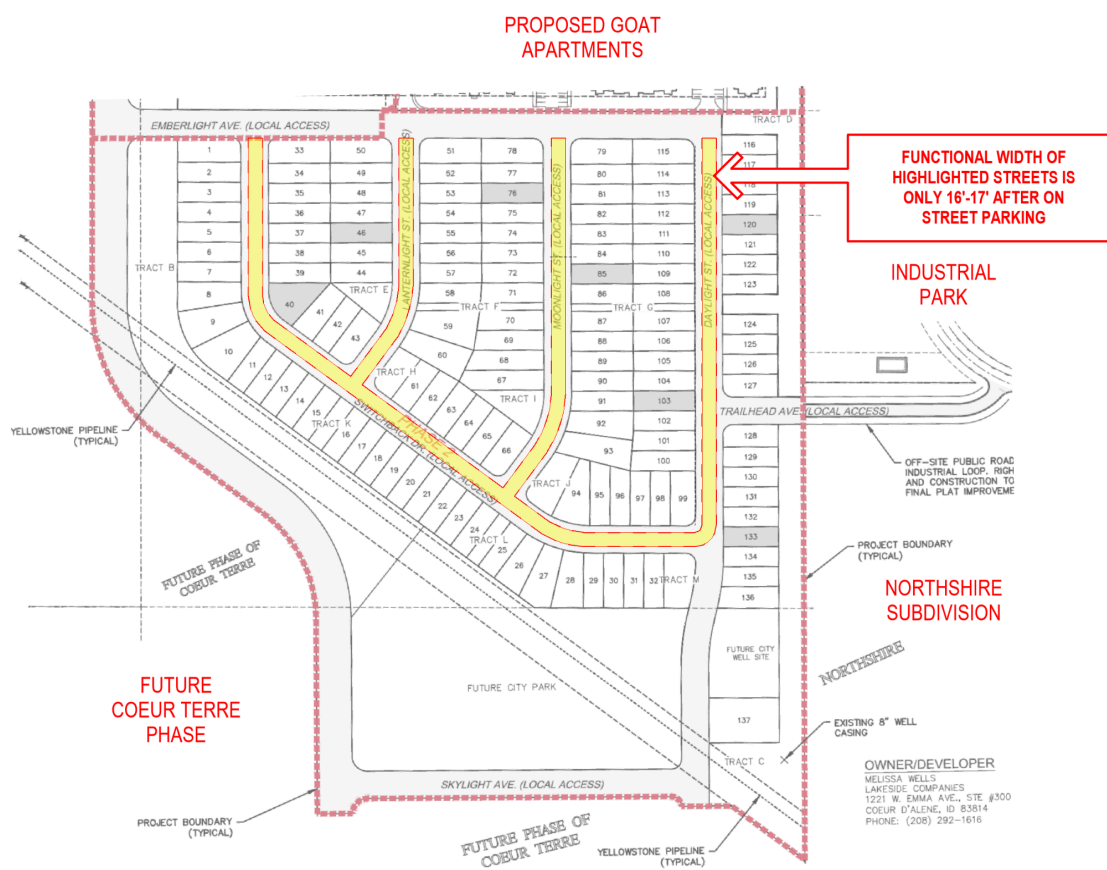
Coeur Terre Phase 1 R-8 subdivision diagram depicting streets which will be constrained by street parking
